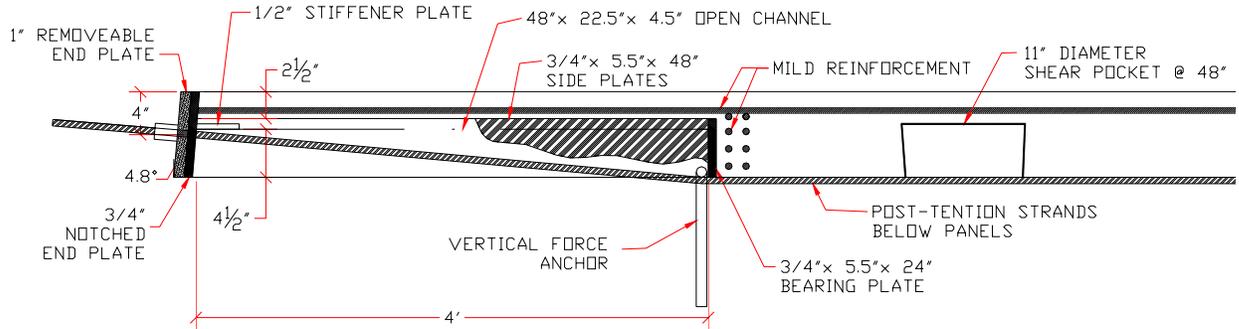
Elevation view of the longitudinal post-tensioning strands under the panel.
